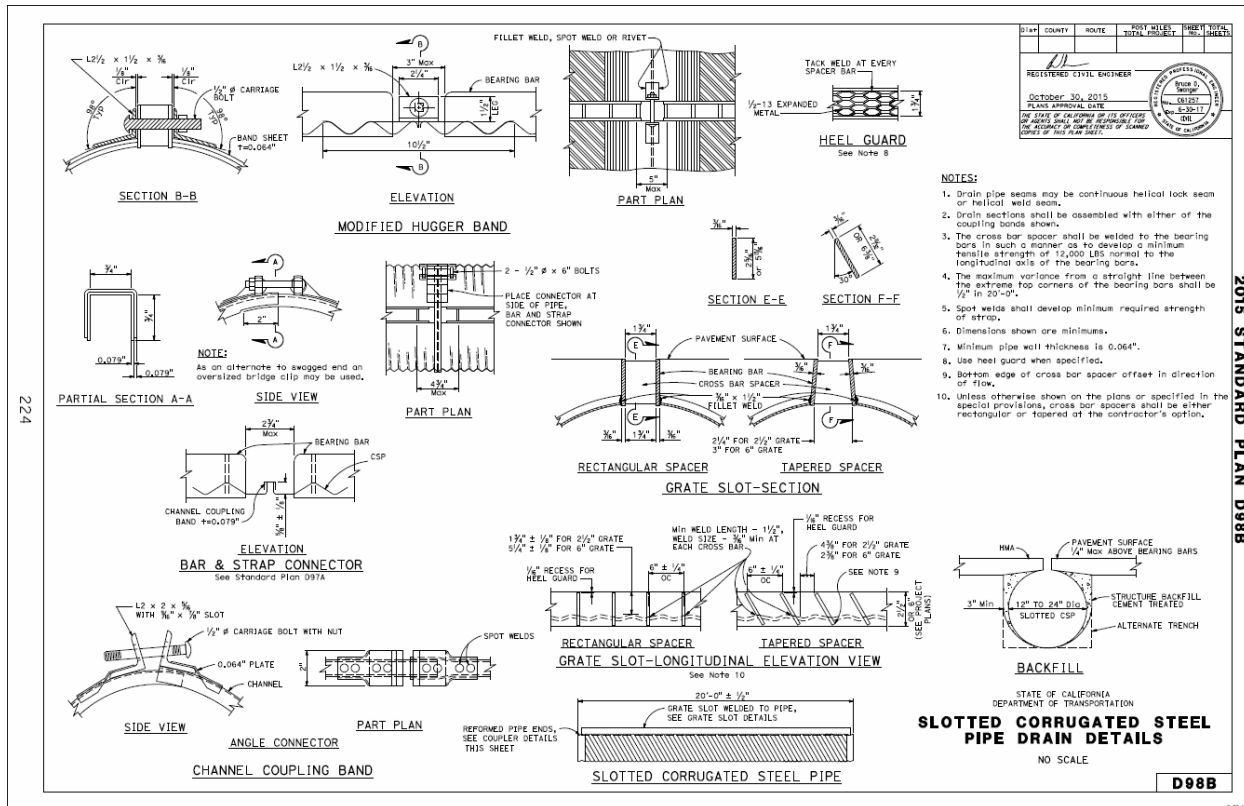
Standard Plan D98B for Slotted Corrugated Steel Pipe Drain [5].
